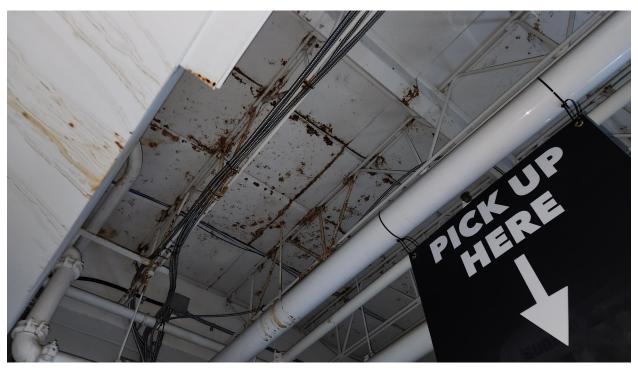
Deterioration of Low Roof structure at northwest corner (c.1951).
